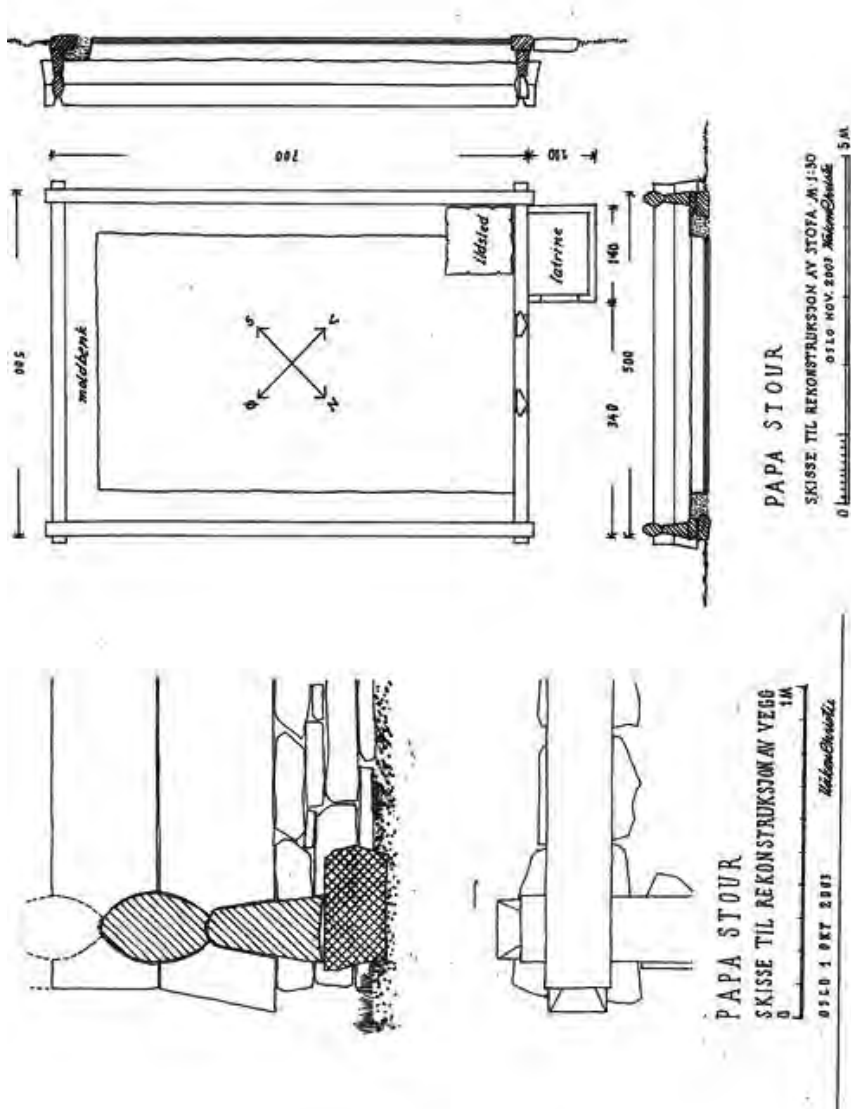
Sketches of proposed timber reconstruction (Hakon Christie)
